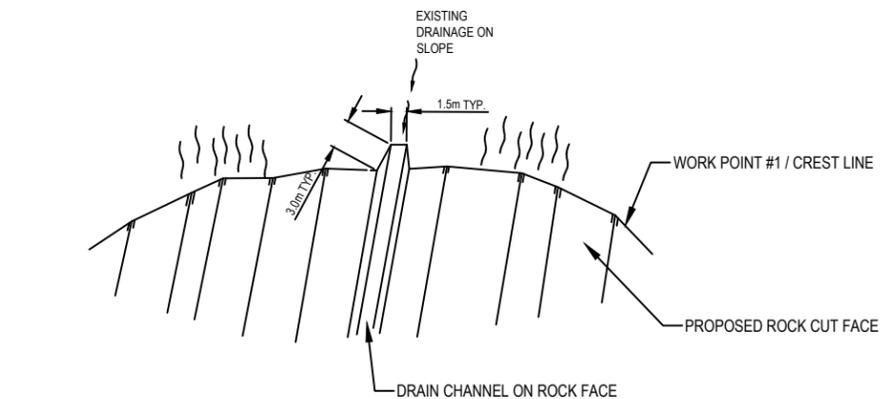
DETAIL A: REMOVAL OF DRILL OFFSET BENCHES
